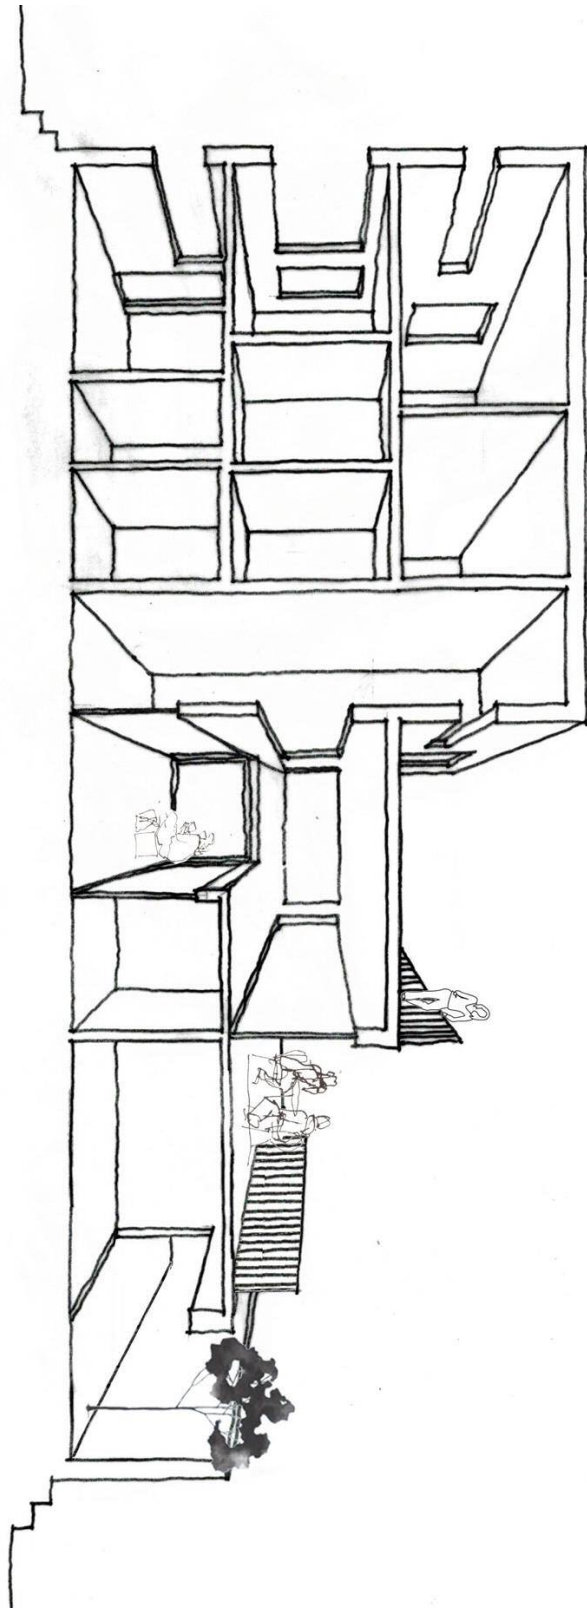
This perspective shows the interior space of the house (type 3) and the roof terrace.
